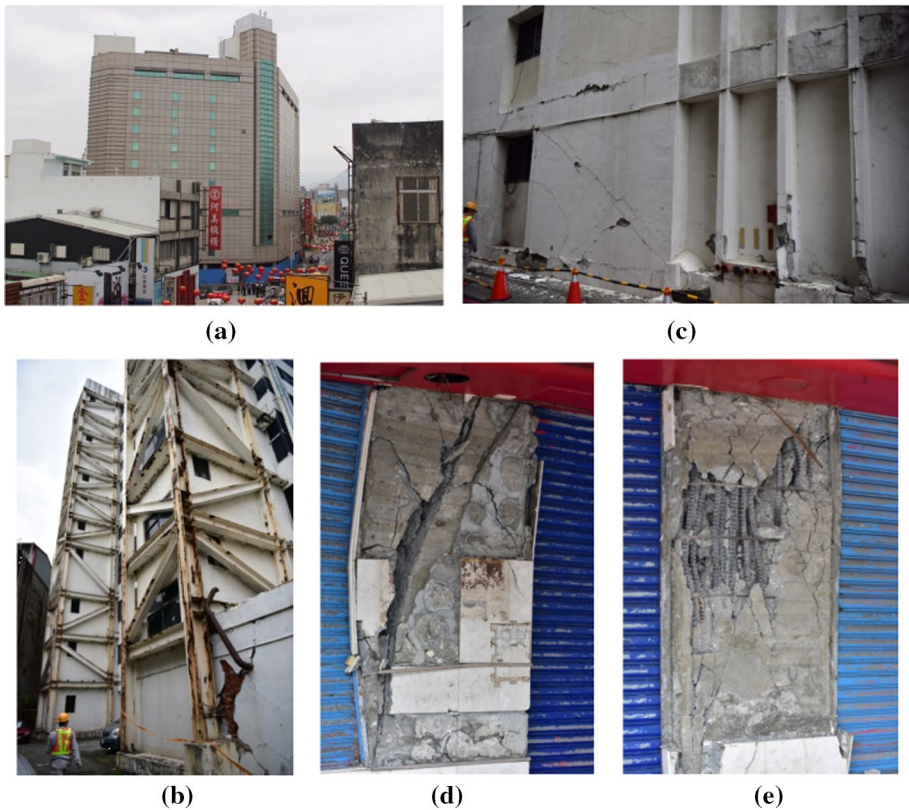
Photographs of the damaged 12-story department store: a overall view, b retrofitting with a steel braced frame, c side view, and d and e severely damaged bottom columns
